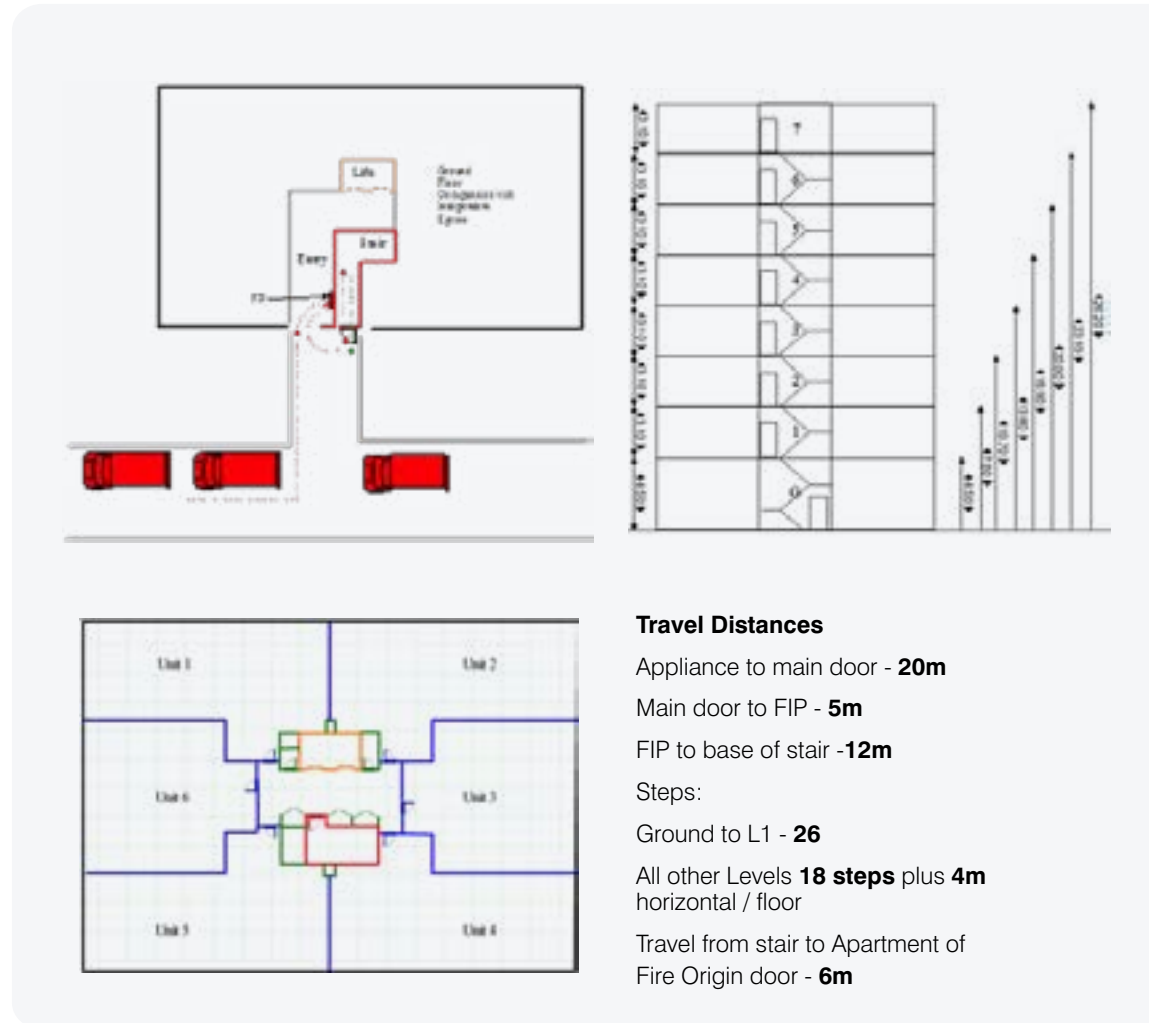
Building layout and critical dimensions for fire brigade intervention modelling.
